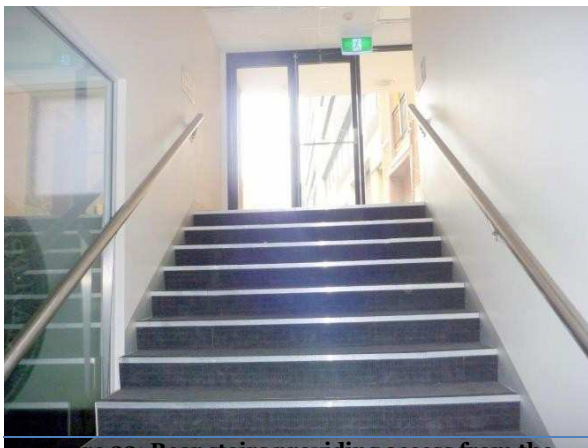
Rear stairs providing access from the Elizabeth Street level, up to Trafalgar Place. The finished floor level is approximately 2.11 m below the Trafalgar Place level at the south-western end of the site.
